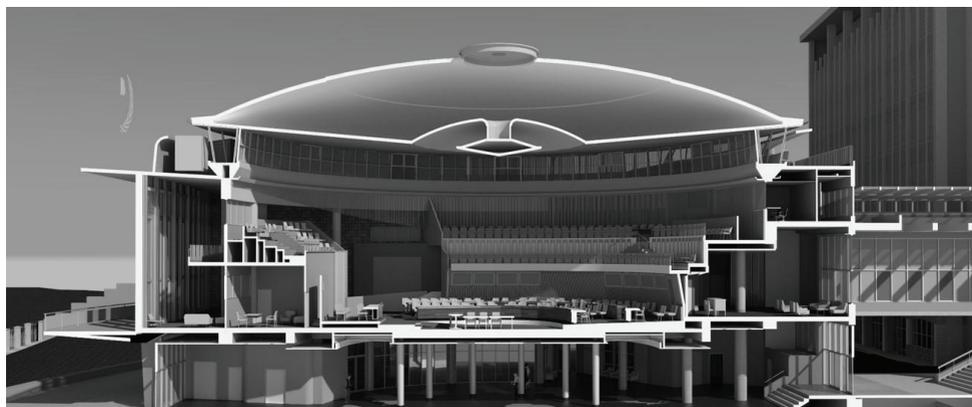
Perspective Section - Proposed BIM Model B & W Render (Source: CGAMW 2017).
